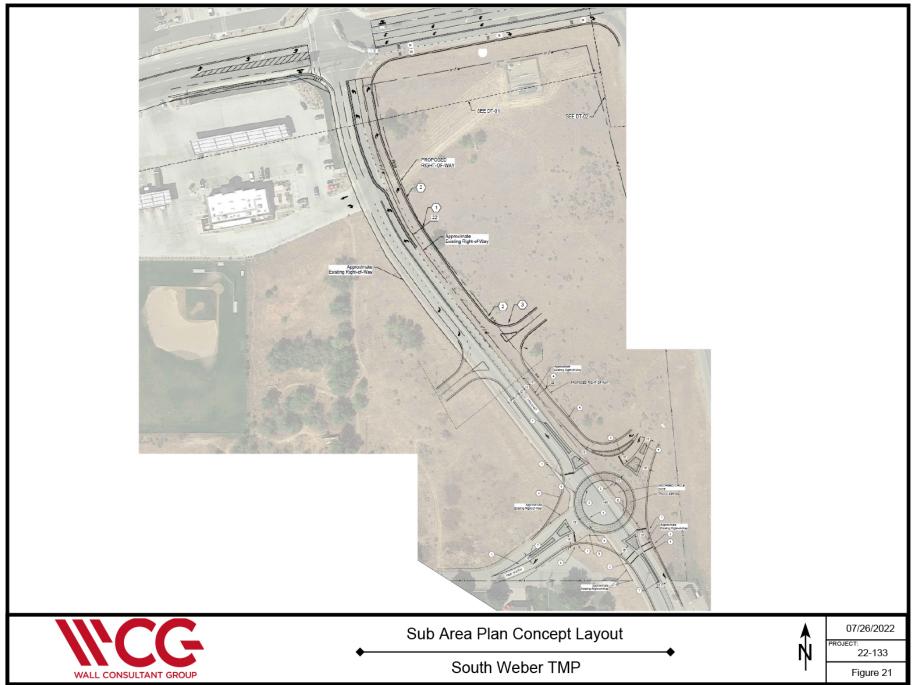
SUB AREA PLAN CONCEPT LAYOUT
